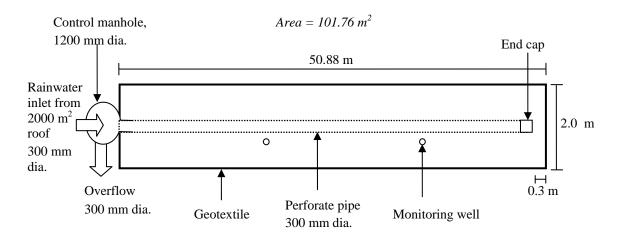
Plan view of the infiltration trench receiving roof runoff only
